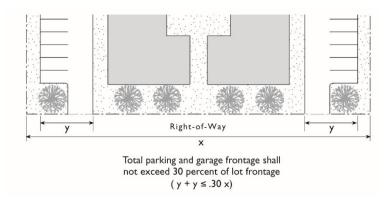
d.1B(2): Parking and Garage Frontage Limitation
